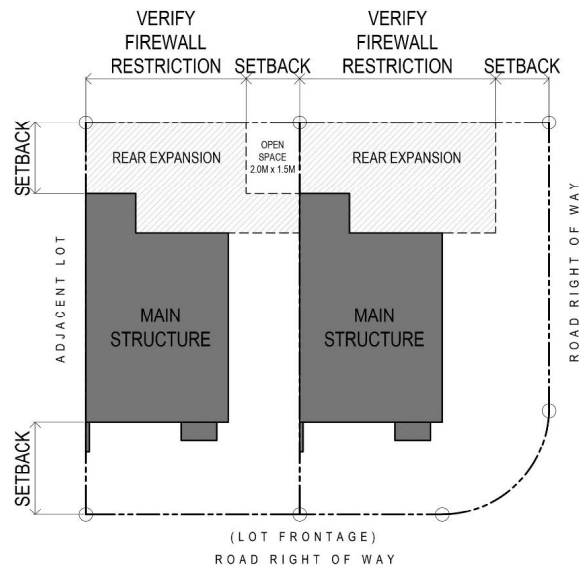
Second Floor Expansion Area for BP220 Development - Solo Houses
